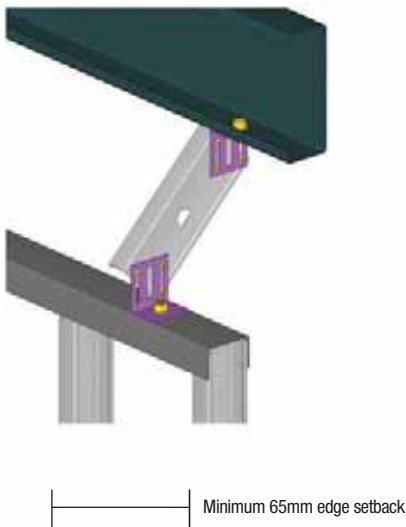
M100 Connection Detail for 76mm, 64mm and 51mm Jamb Studs
